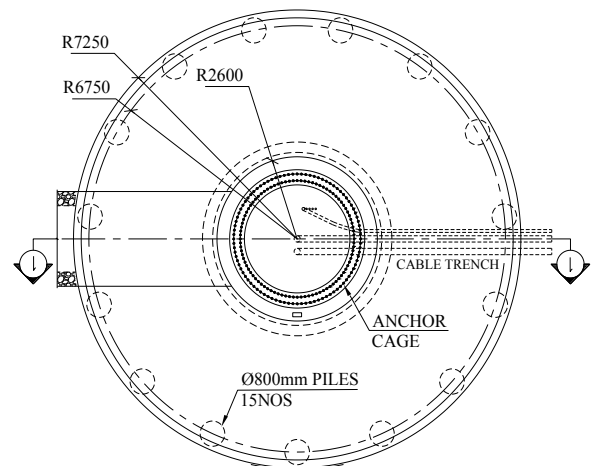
Basic Layouts of Wind Turbine Pile Cap
